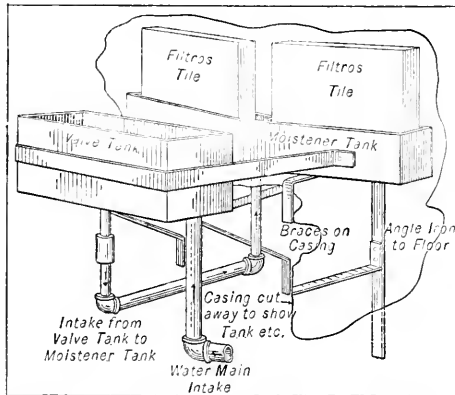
EVAPORATING TANK AND CONNECTIONS FOR ATTACHMENT TO FURNACE CASING.
